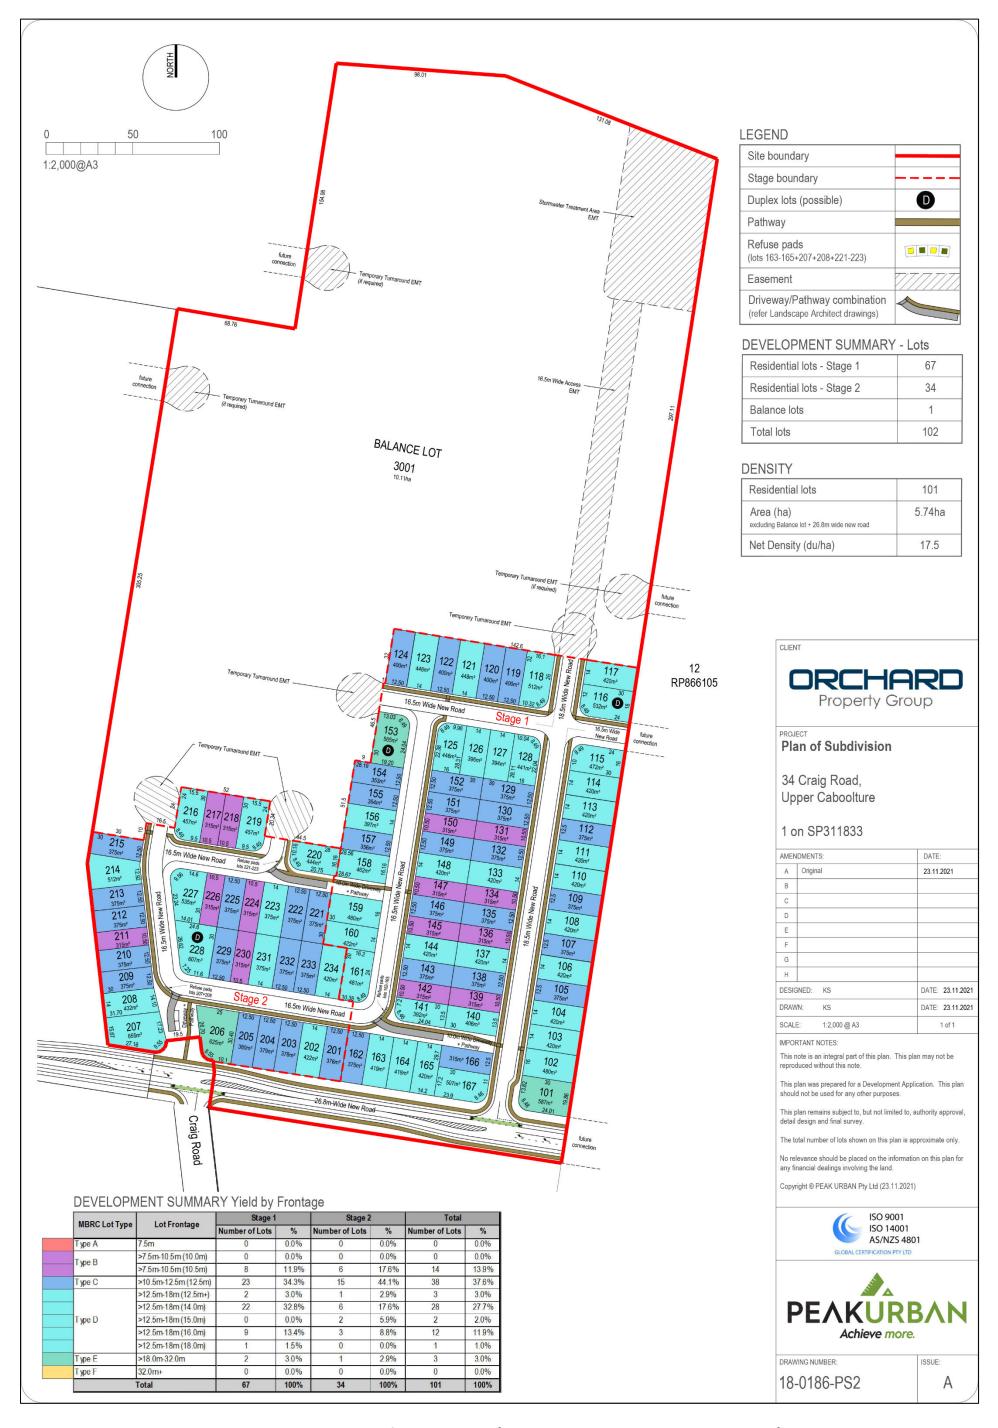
Site Plan for Orchard (Stages 1 and 2 Shown Outlined)
